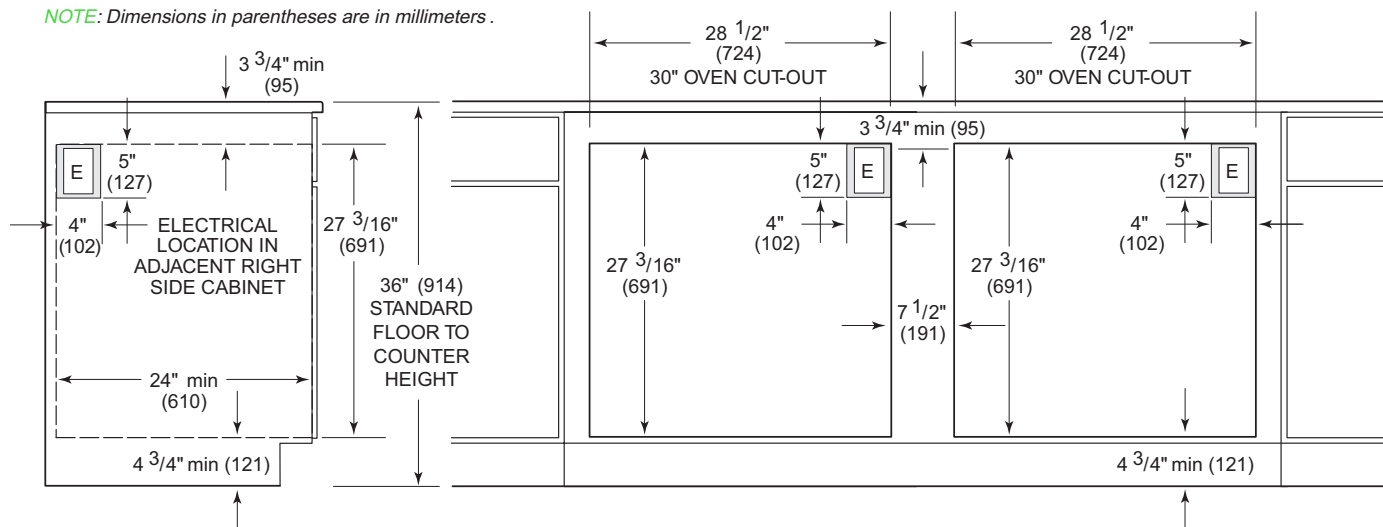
Undercounter Cutout Dimensions and Electrical Placement for SO30
